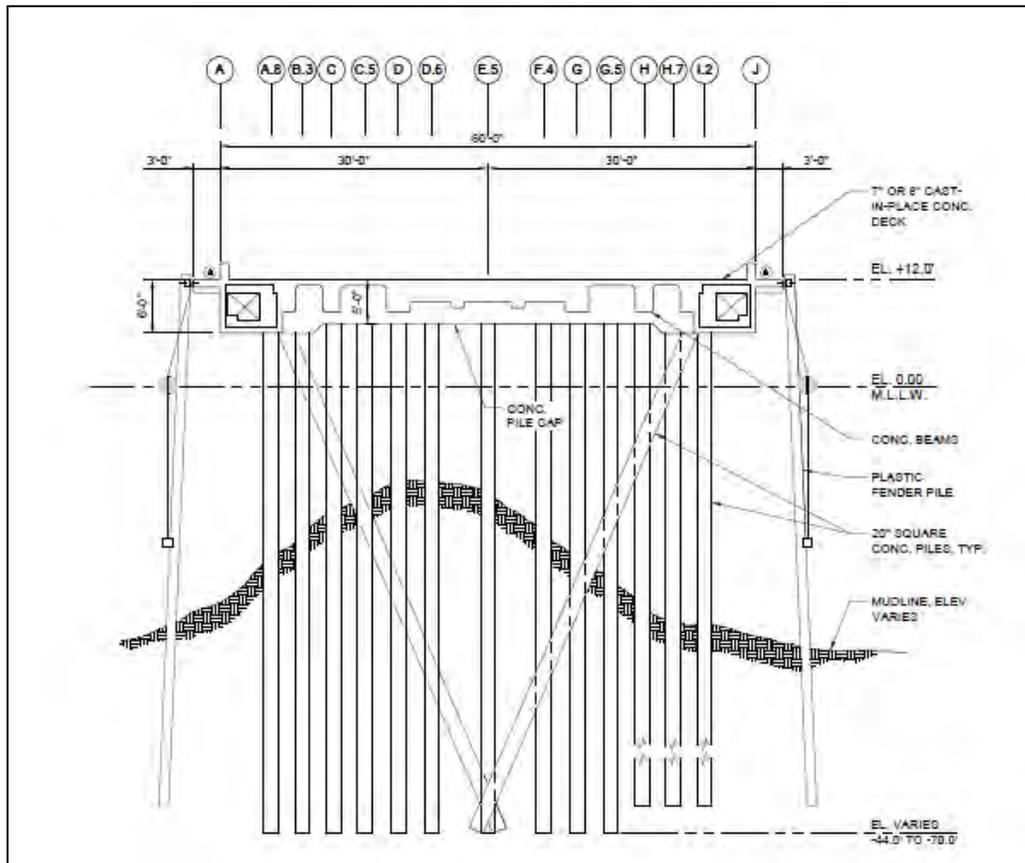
Existing Cross-Section of Pier 6 (typical)
